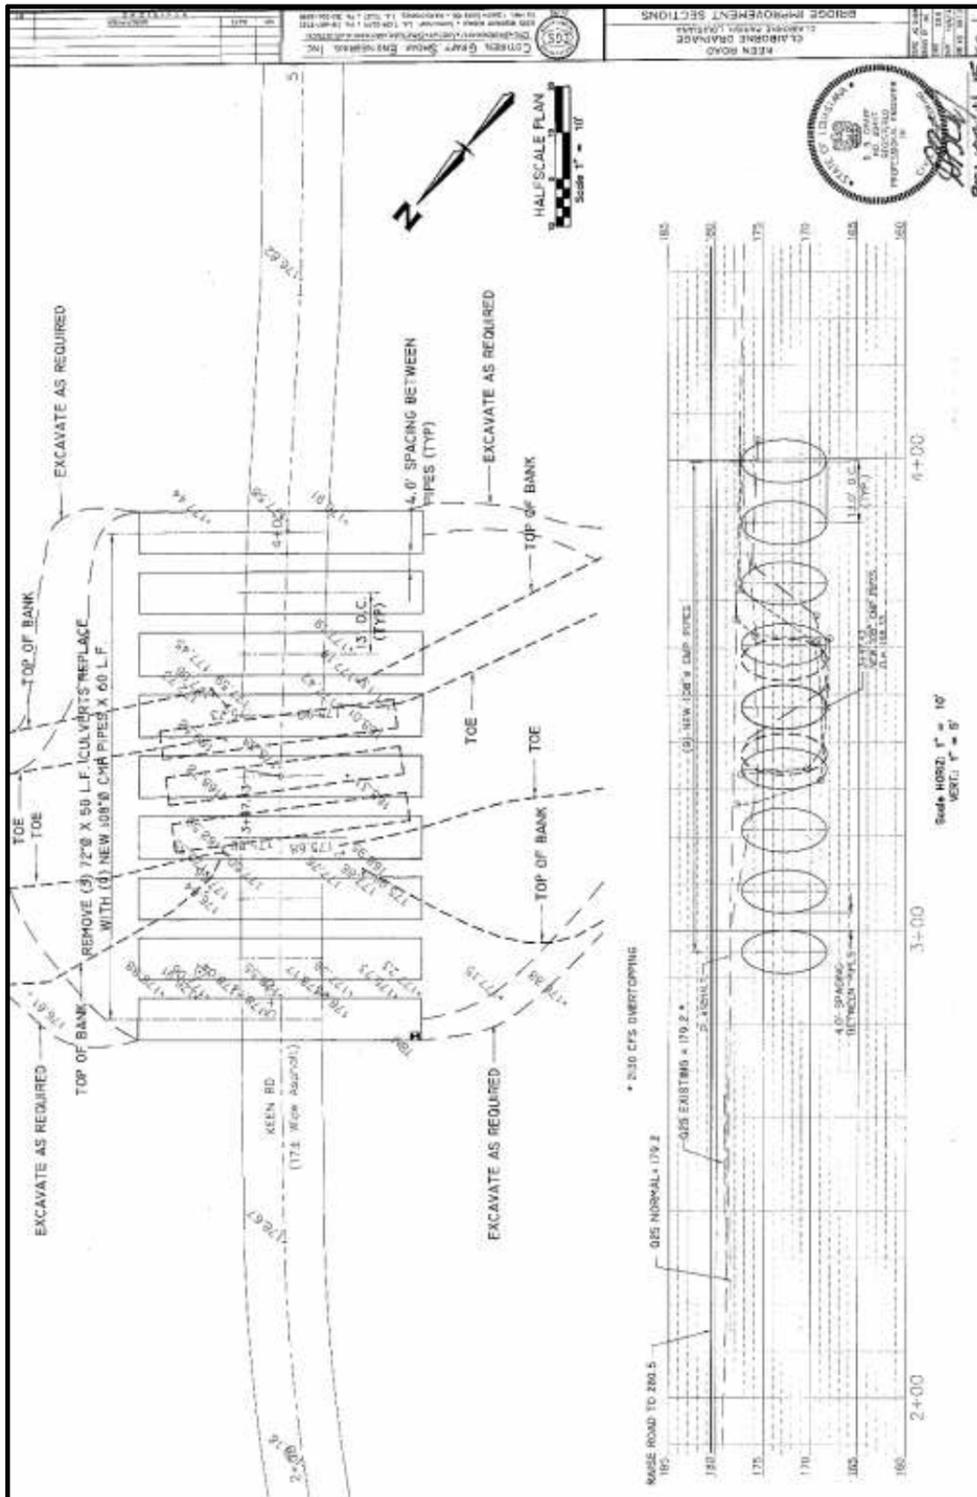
Construction plans for the proposed Keen Road in PA 5 (Cothren, Graff, Smoak Engineering, Inc. 11/8/12).
